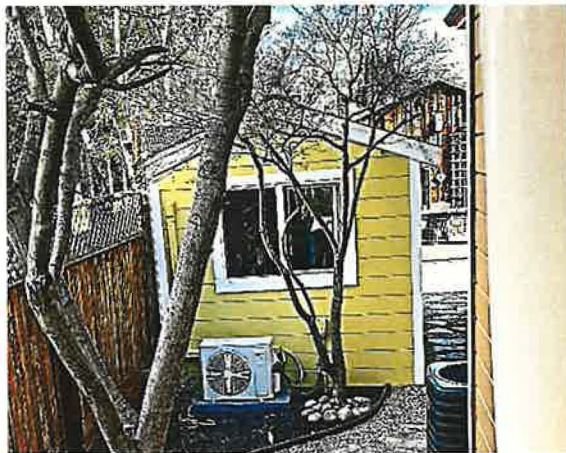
; View: “Original” Garage south side-elevation & rear
